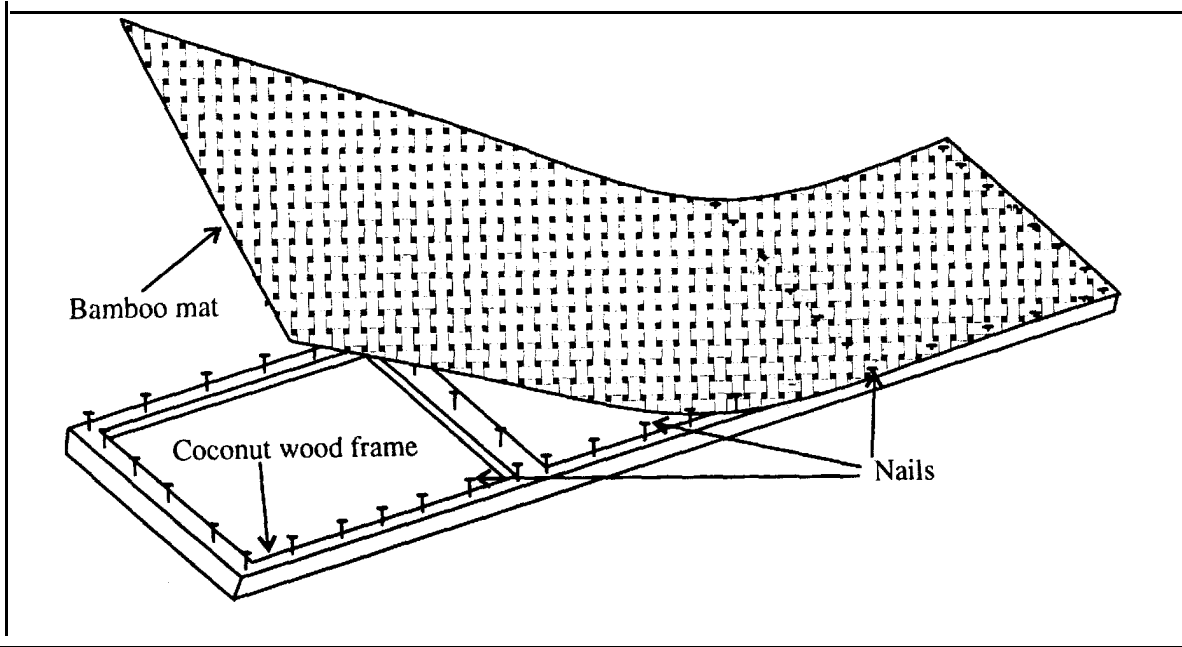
Coconut wood frame with horizontal-vertical bamboo mat reinforcement
